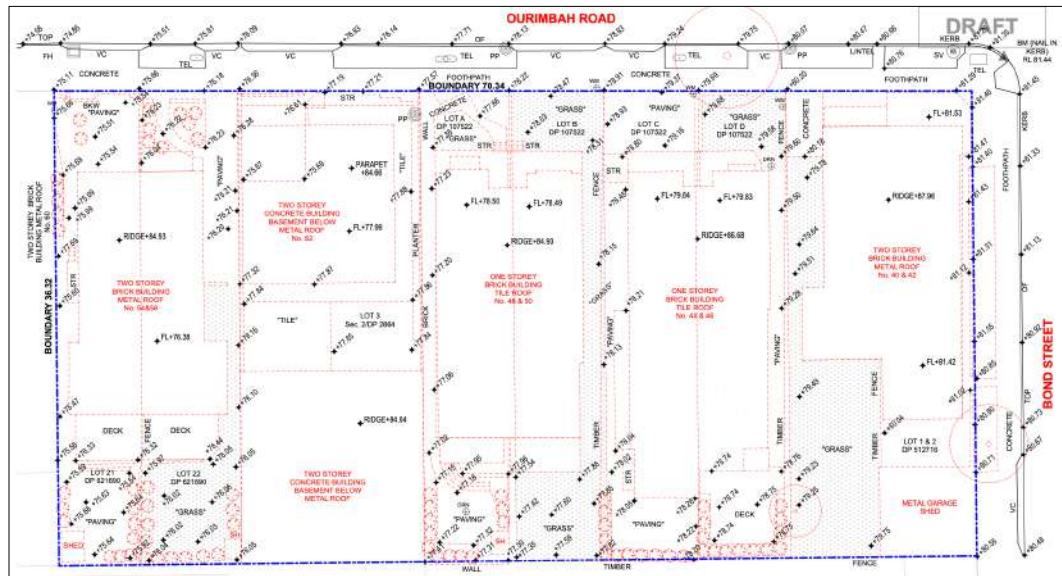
Proposed demolition plan for Nos. 40-56 Ourimbah Road, Mosman.
